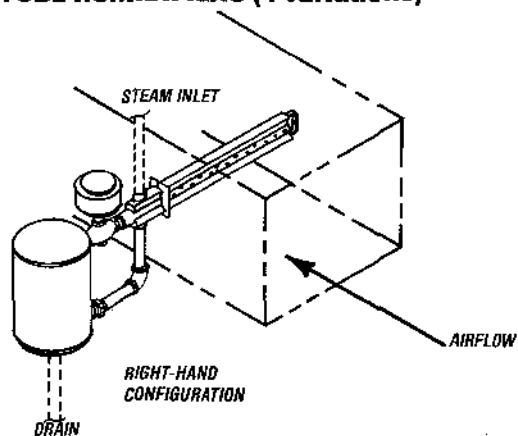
Horizontal tube and horizontal steam discharge. This arrangement comprises majority of uses. If not ordered otherwise, this is how units are shipped. Unit shown in Fig. #1 is right-hand. (To change, refer to changing from right to left on the bottom of this page.)
